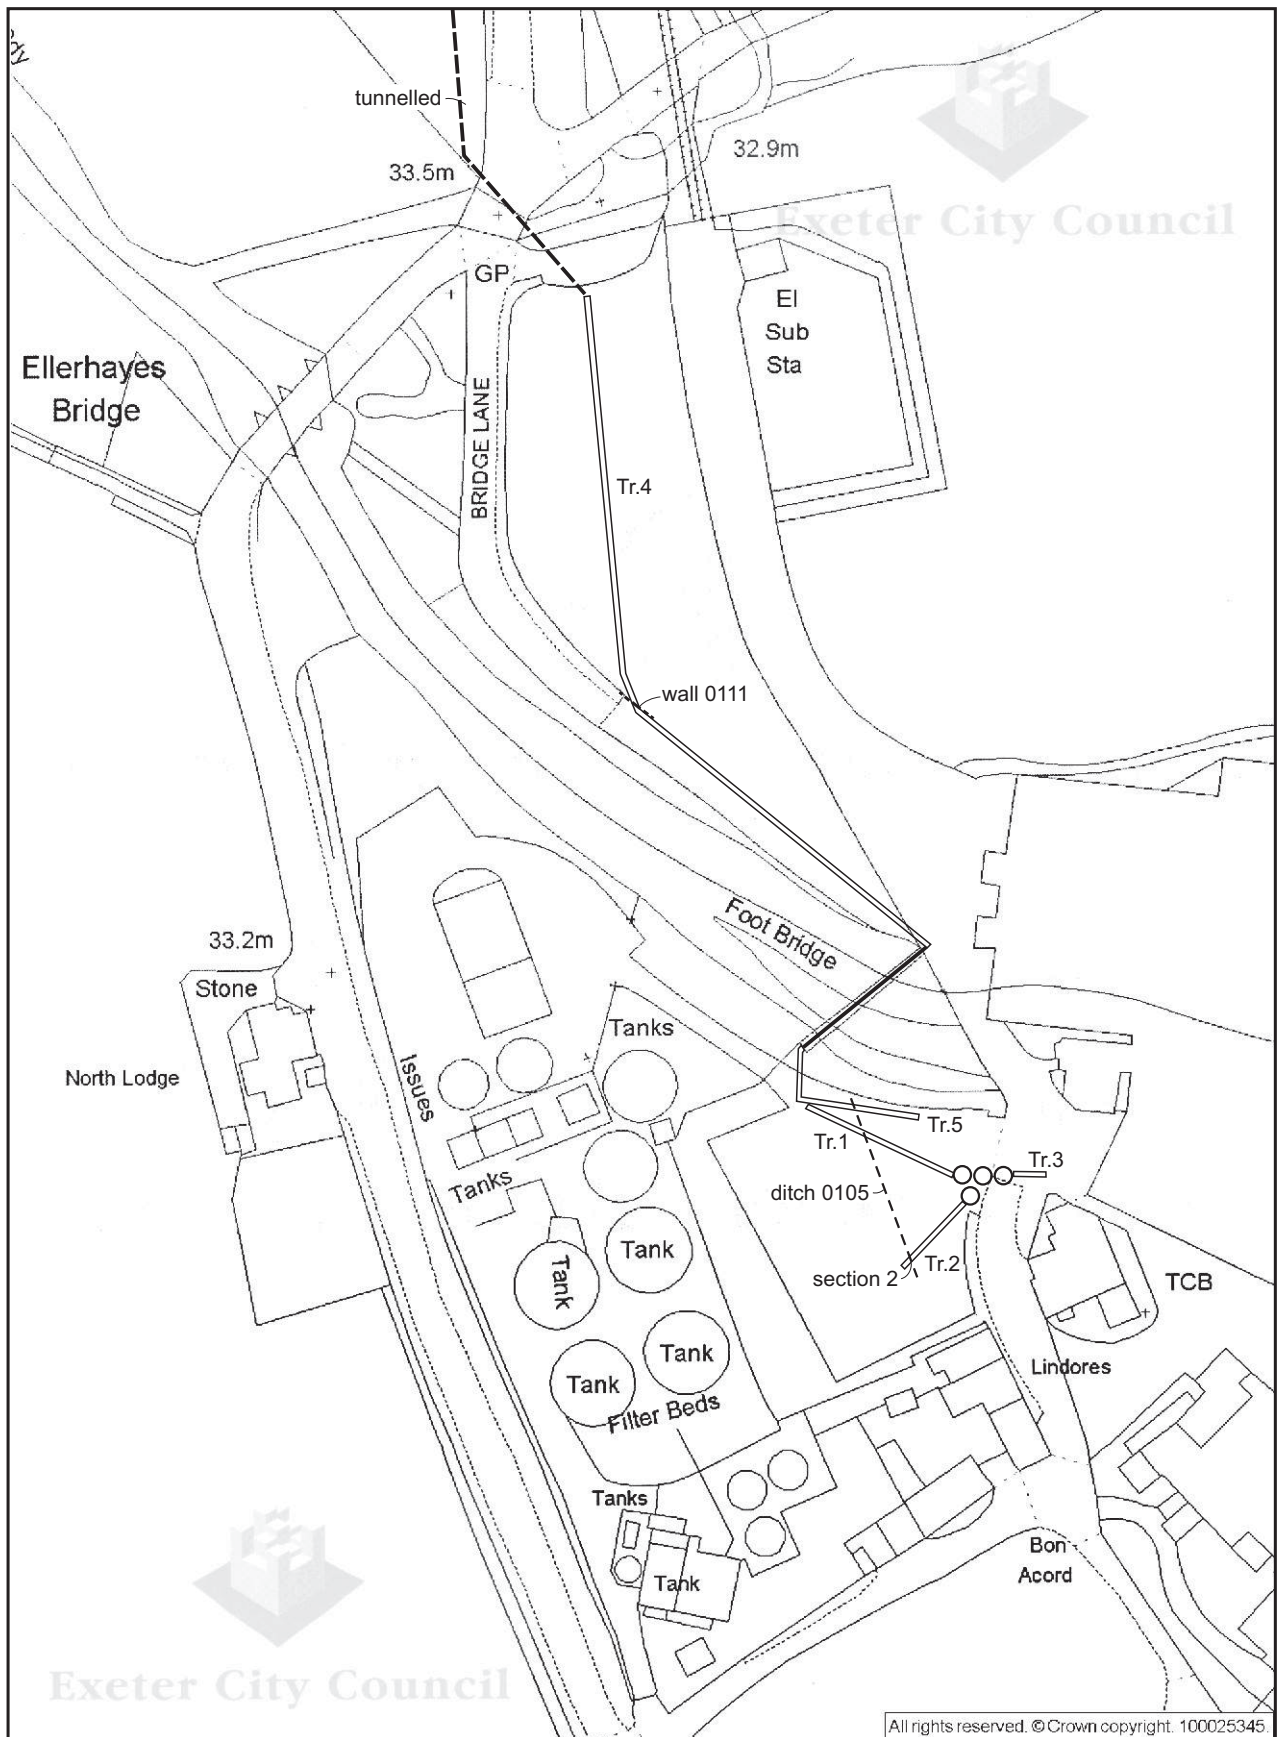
Location of trenches and features in the Silverton Mill complex. Scale 1:1,250.
